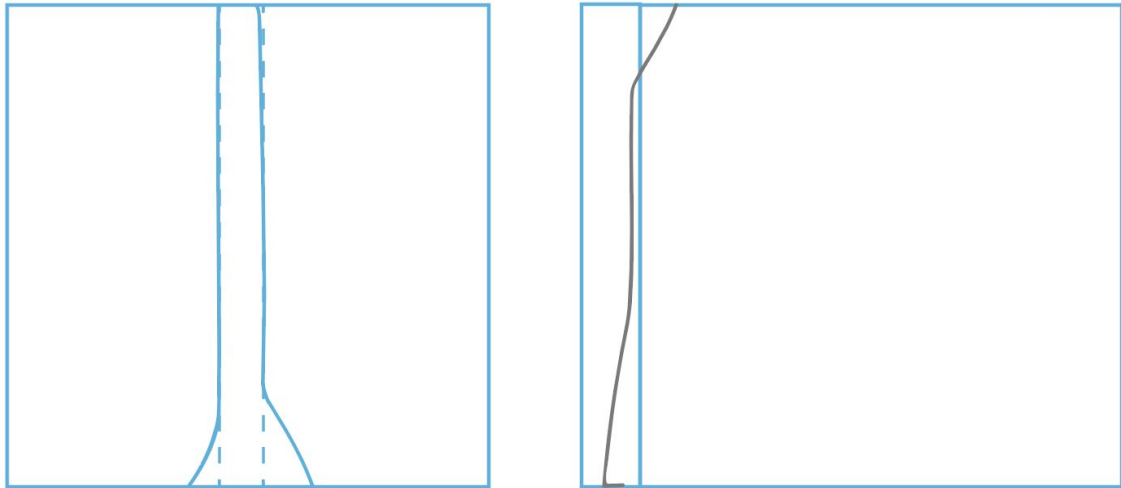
Crack Pattern Four in the flange and web. On the flange, the surface of the crack was between other cracks of Crack Patter One
